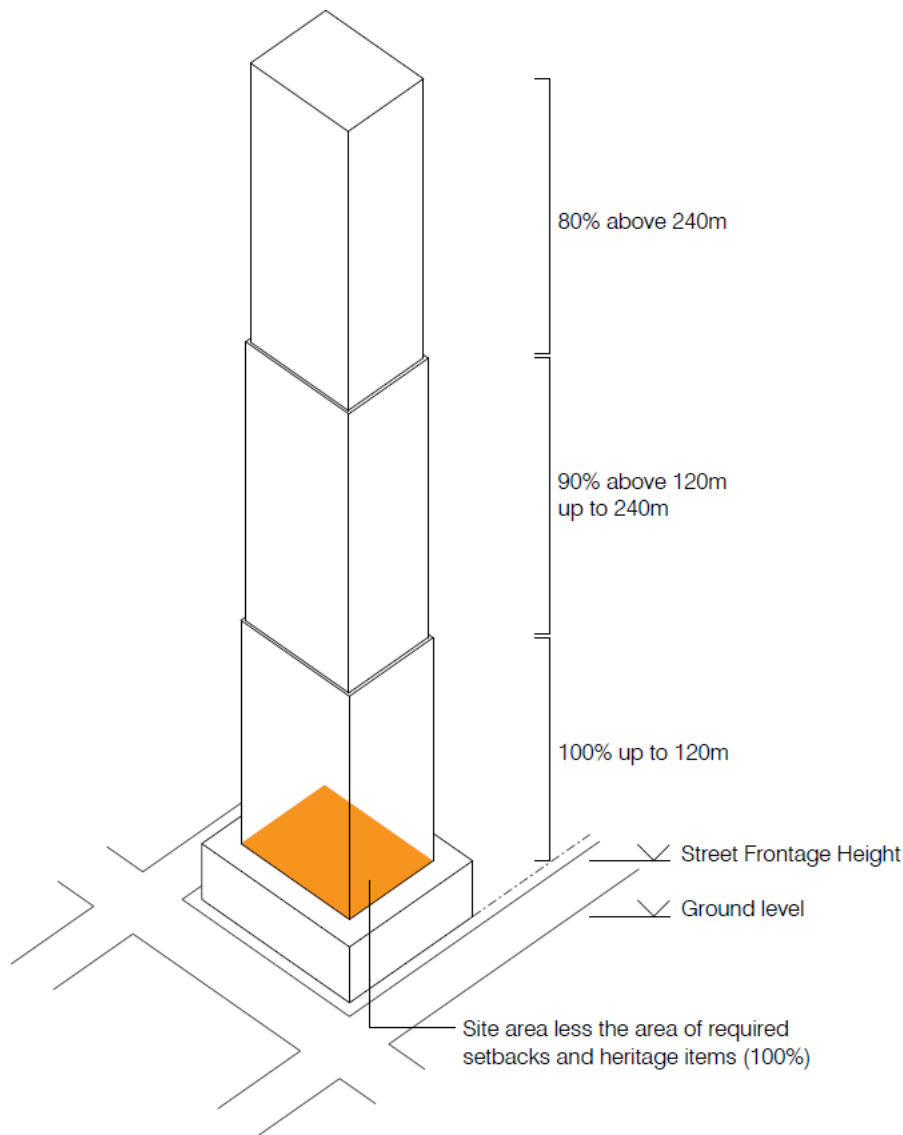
Maximum Building Envelope Area above Street Frontage Height
